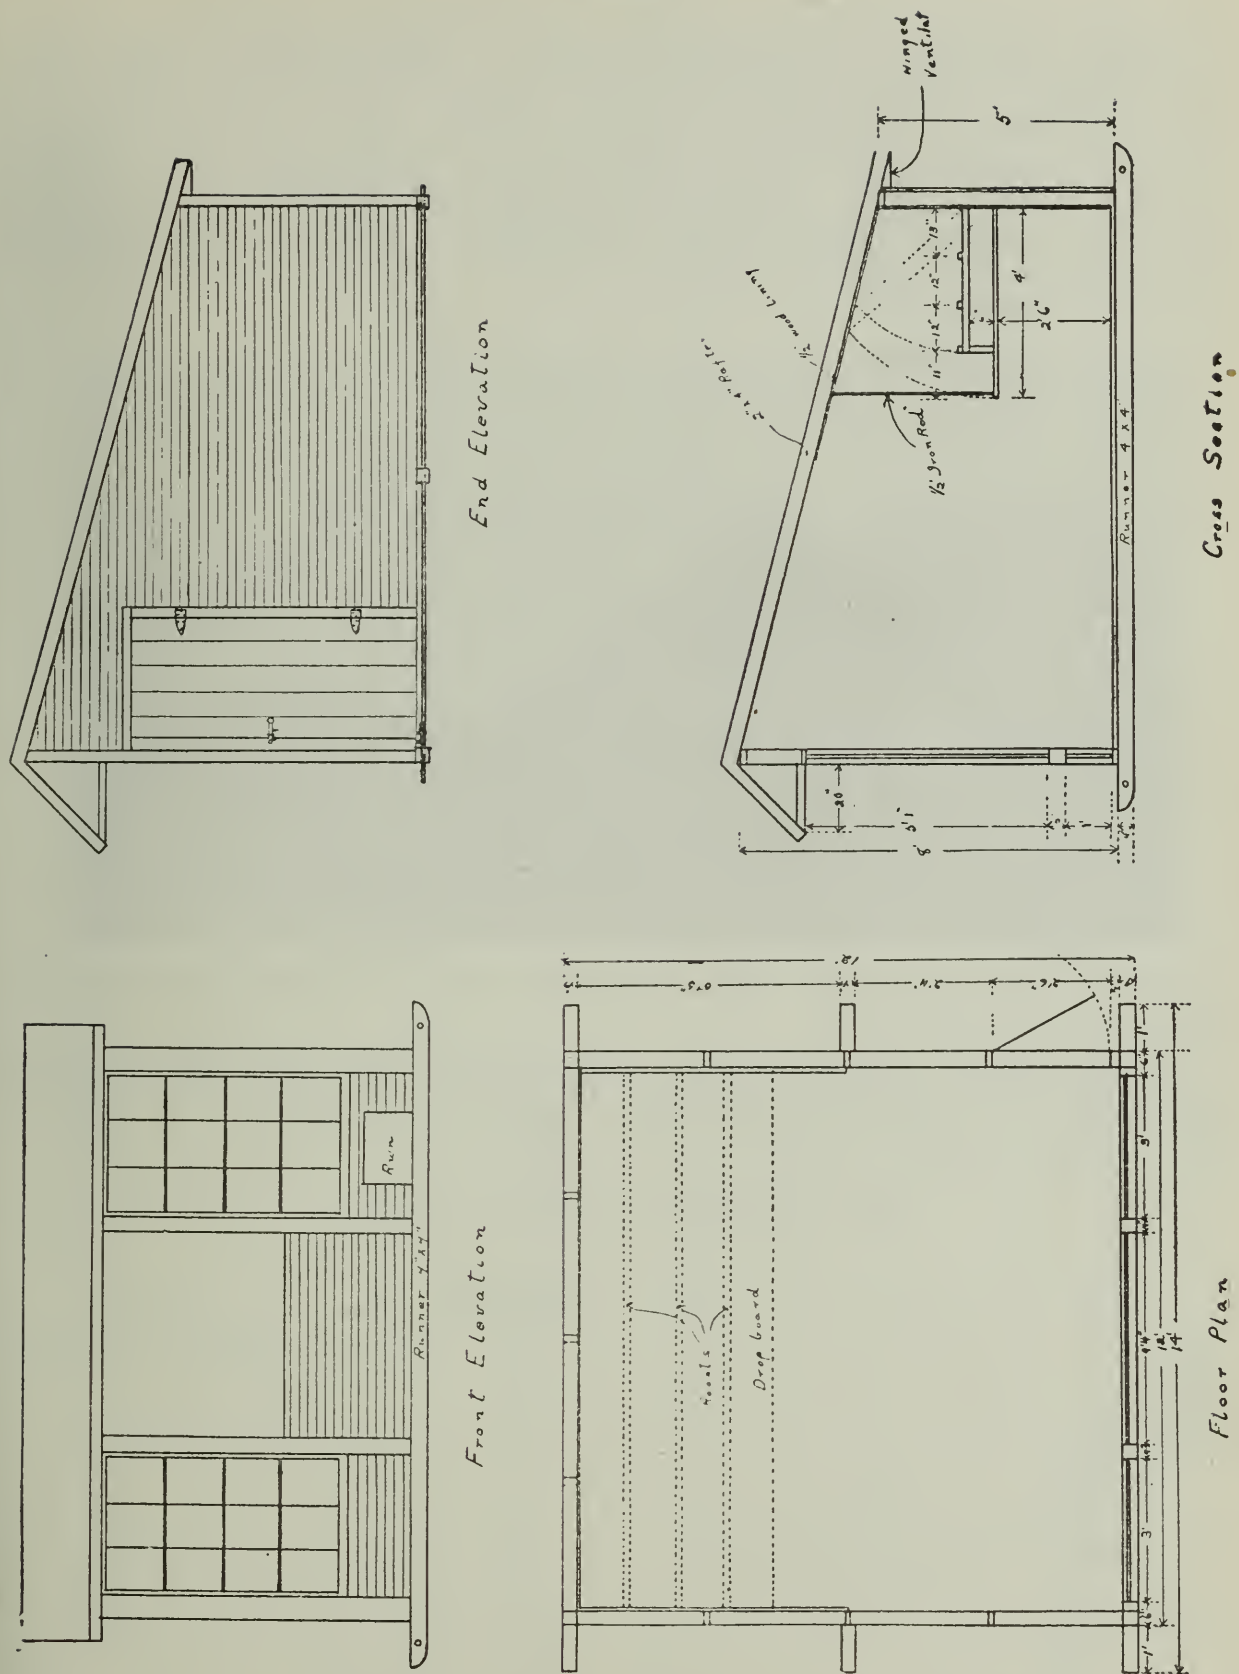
Plans, elevations and cross-section of 12' x 12' Colony House, suitable for Colony Brooder or Laying Pen.
